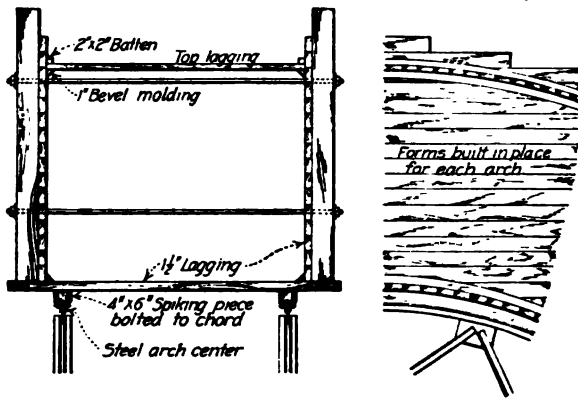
Arch rib forms on steel centers for Brooklyn-Brighton viaduct, Cleveland.
